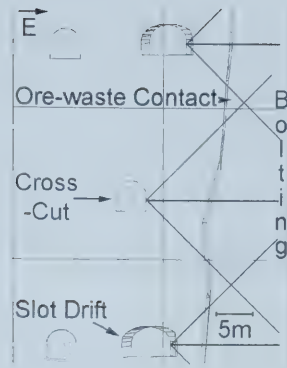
Section Depicting Cable Bolt Gloryhole Wall Support
